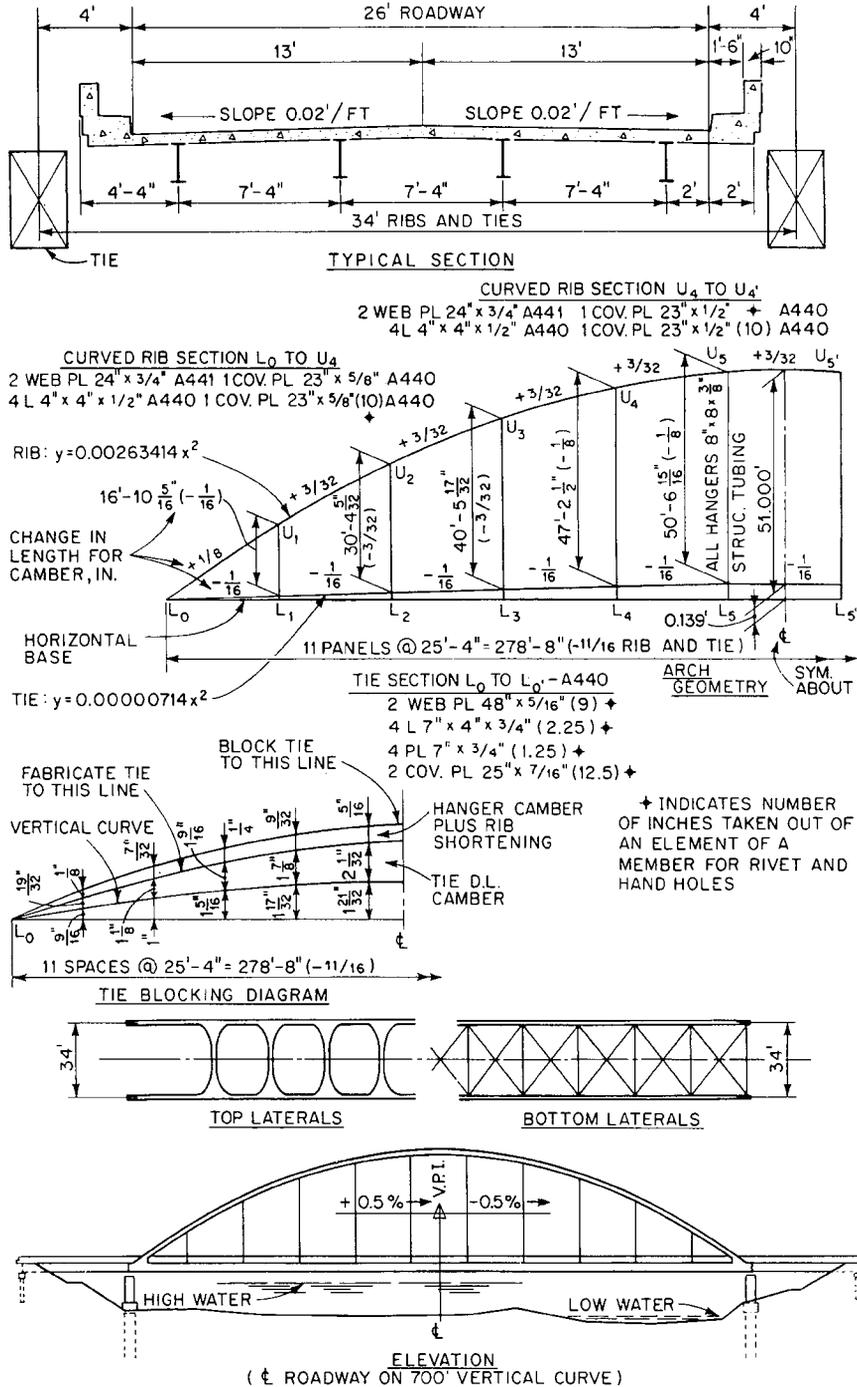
Details of North Fork Stillaguamish River Bridge.
